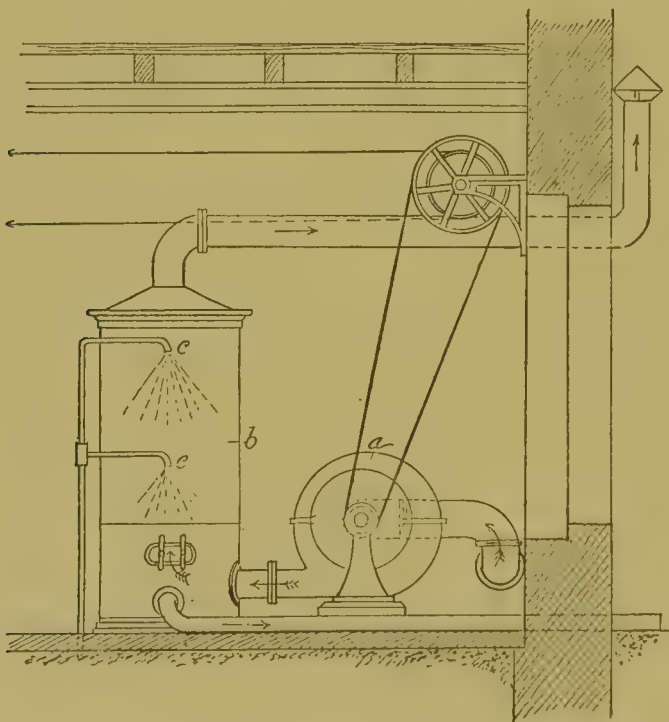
Apparatus for removing dust in manufacturing establishments:
